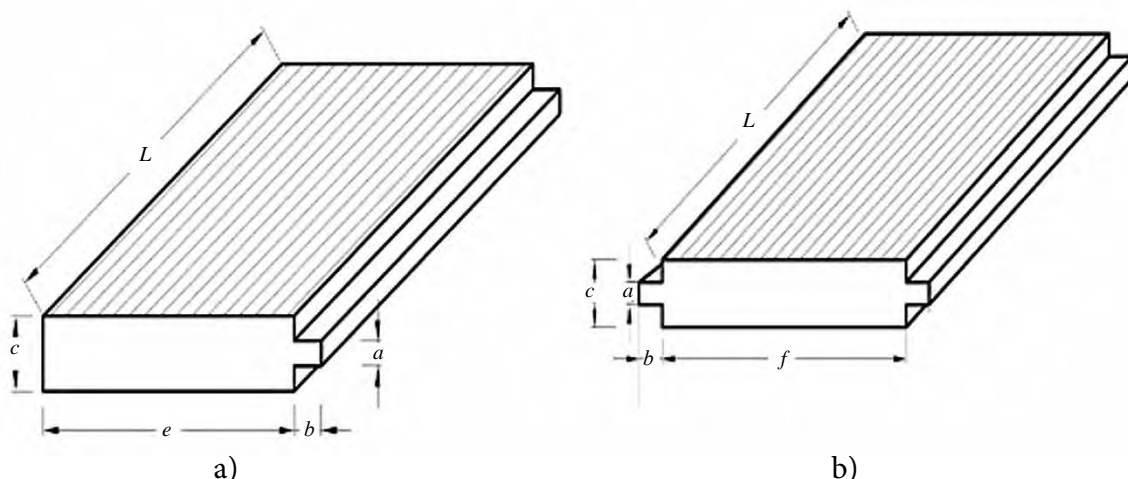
Self-groove wood-based composite parts used in joints for: a) edge part and b) mid part
